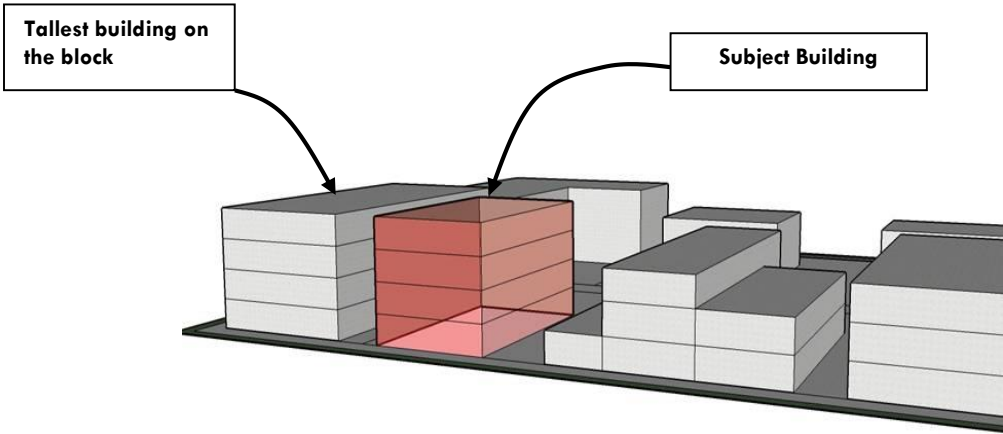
G: No primary structure may be taller than the tallest building on the block, or more than 10 feet taller than the tallest building on the block face across the street, whichever is less.
